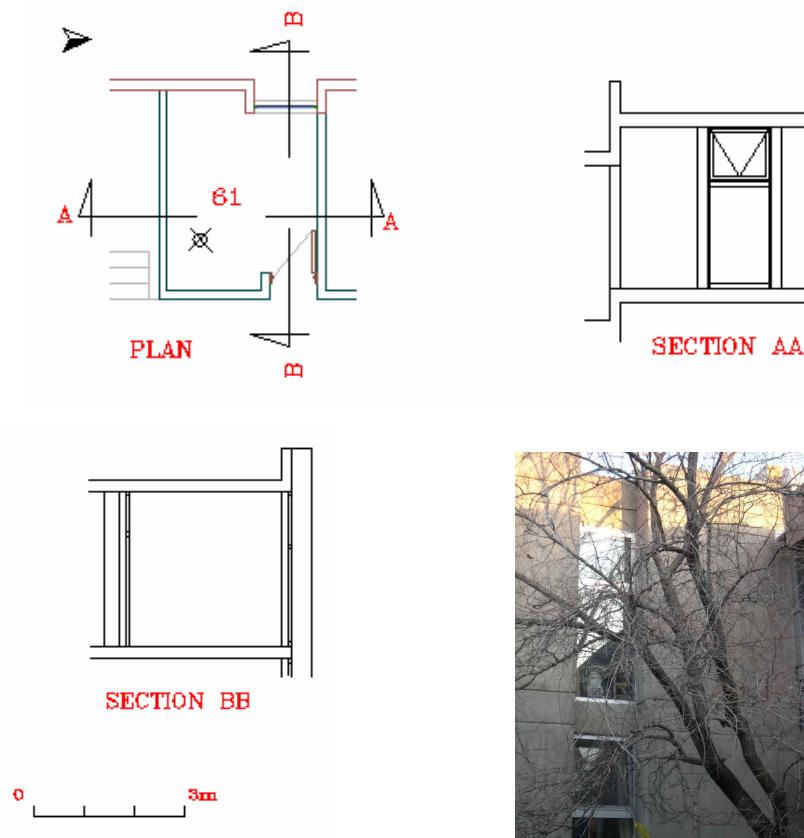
Floor plan, section AA, section BB and exterior view of Room 61.
